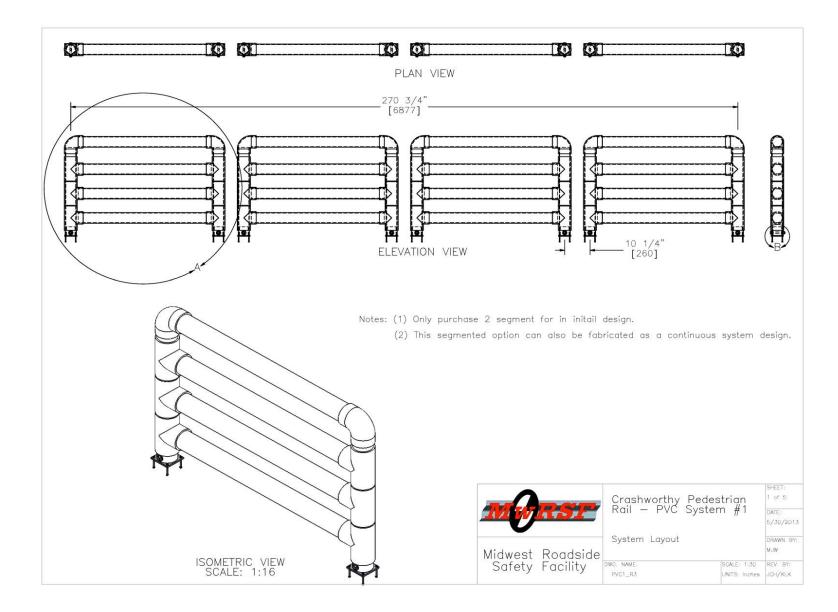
Modular PVC Rail, Design Concept PVC1 (Sheet 1 of 5)
